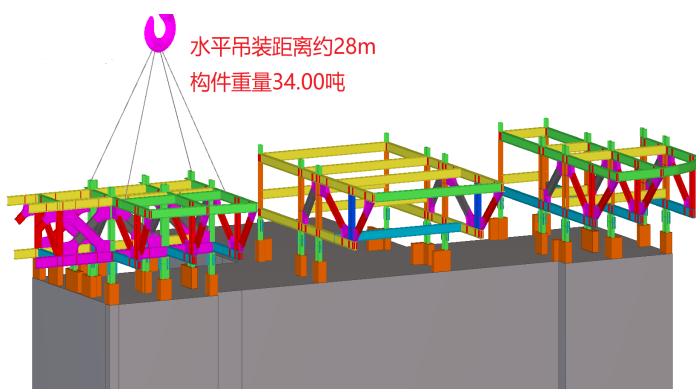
Schematic diagram of truss lifting for the main cantilevered steel structure
